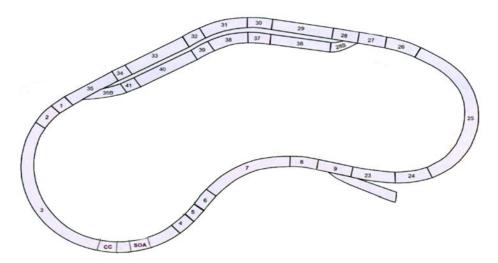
Layout of the Heavy Tonnage Loop Test Track.
